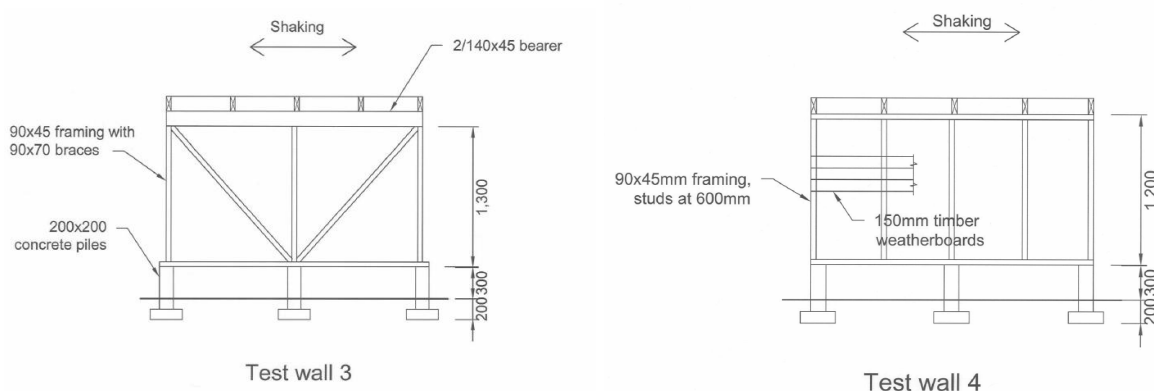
Downslope end elevation of specimen 3 (left) and 4 (right)
